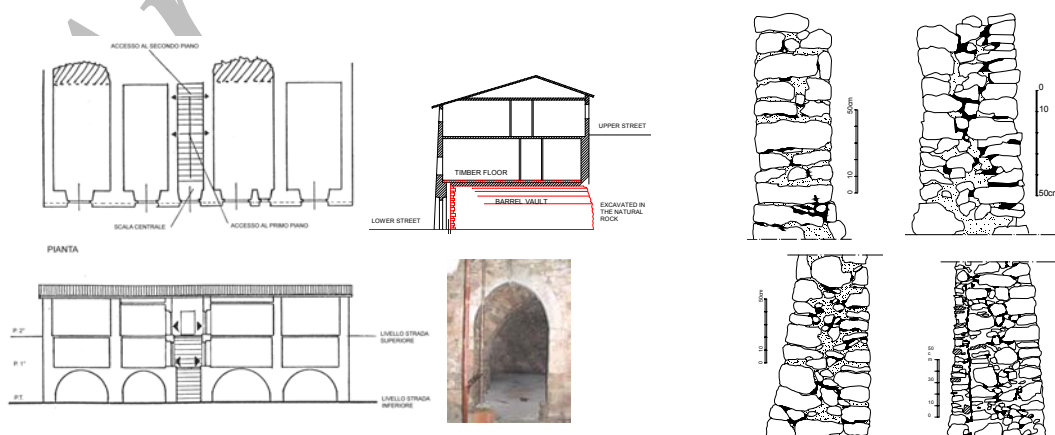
The row buildings typology of Campi Alto and some typical wall cross sections [8]
